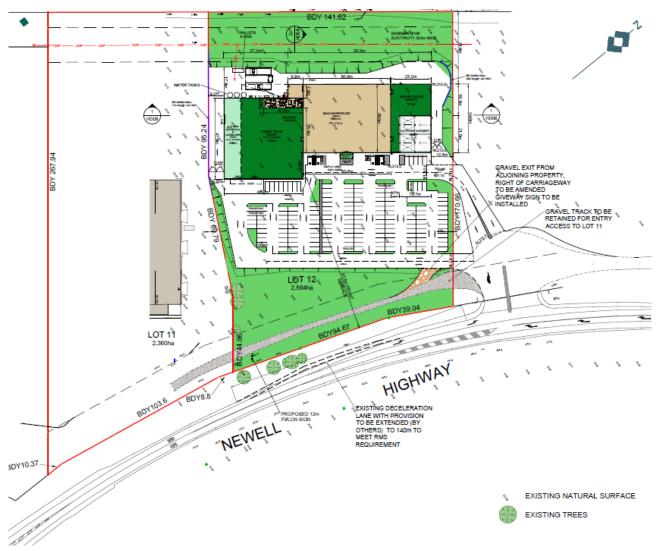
Amended proposed Newell Highway access for Bunnings Narrabri
